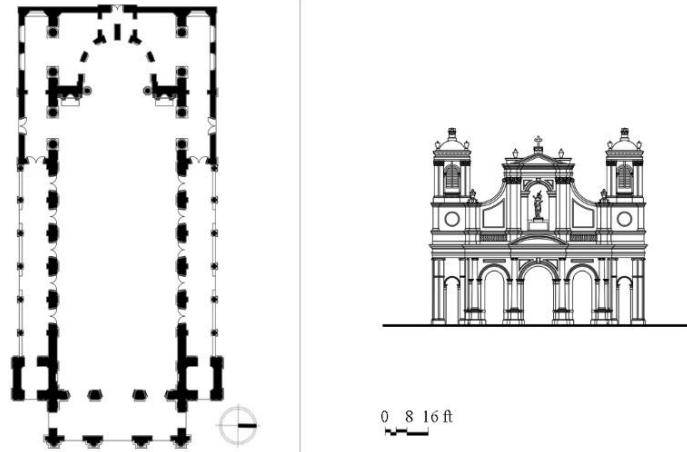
Floor plan and main façade of St. Sebastian's Church, Moratuwa
